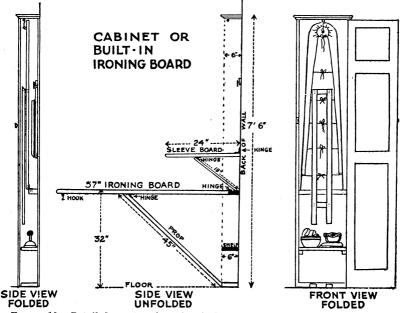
Detailed construction of a folding ironing board and its wall case.
